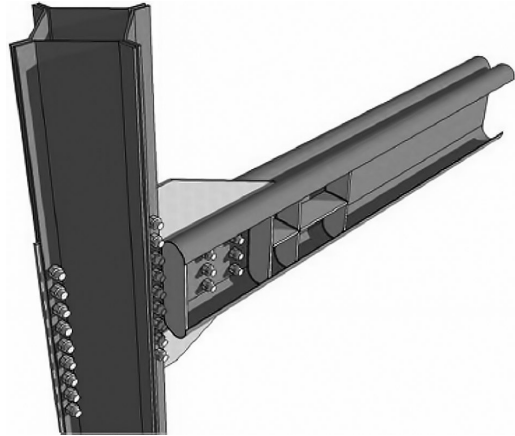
Beam to column connection with stiffeners (Sabbagh et al. 2013)
